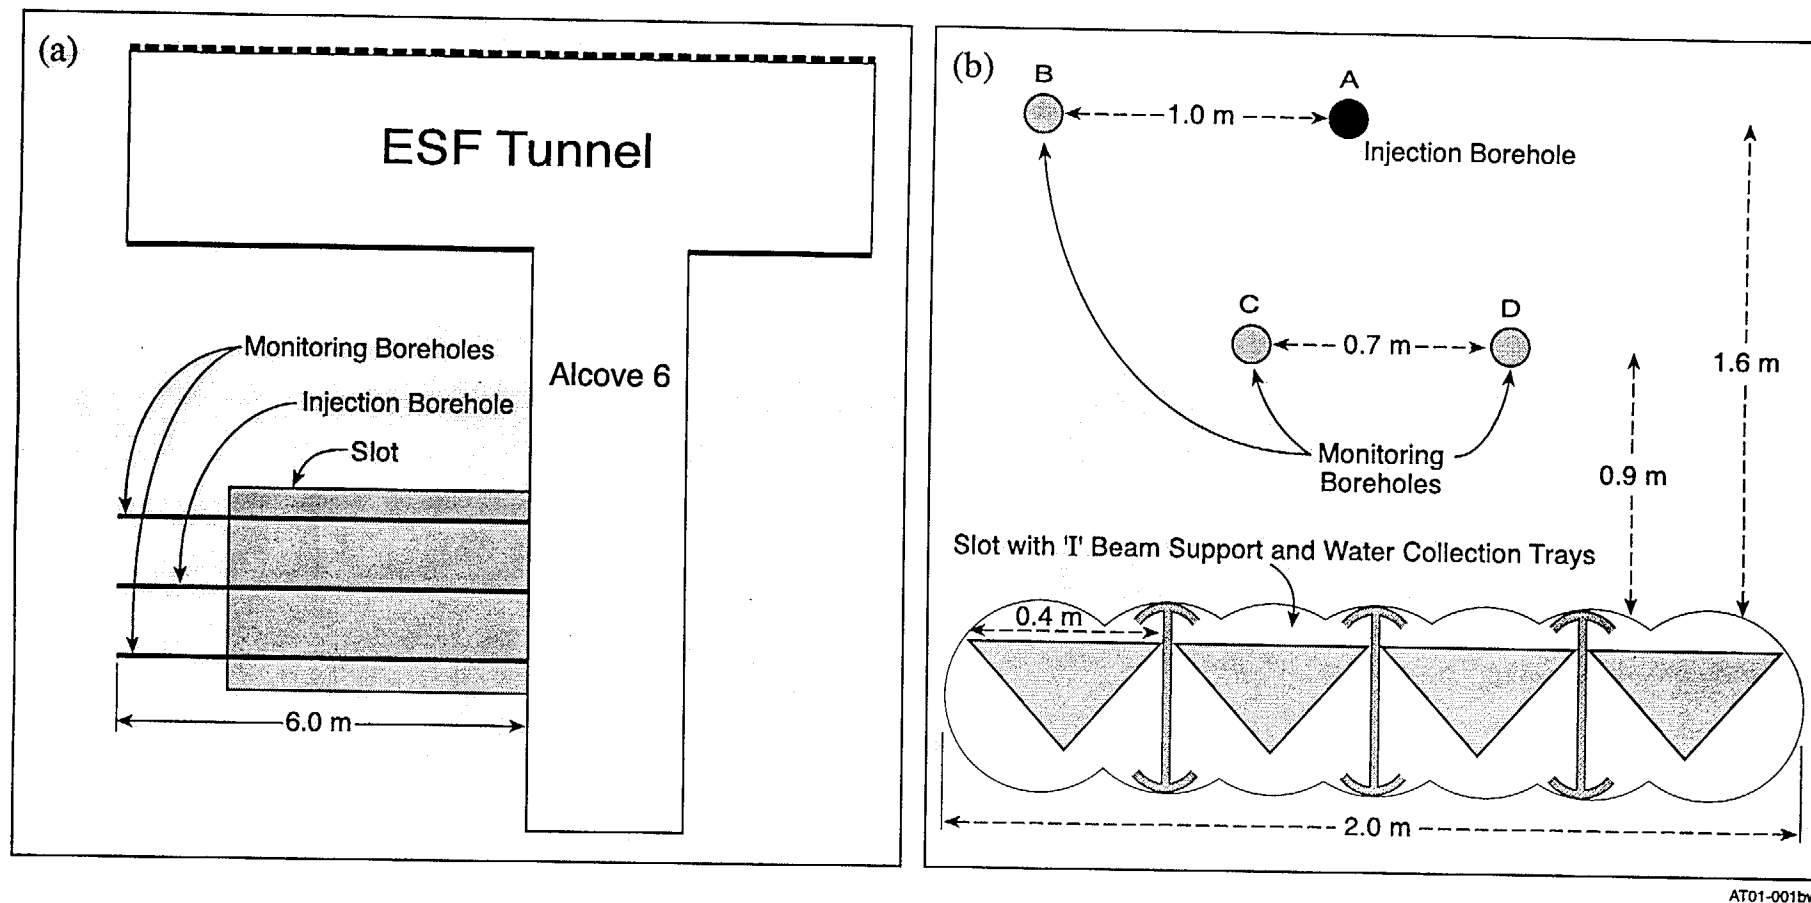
Plan view of location (a) and vertical view of layout (b) of test bed within the ESF at Yucca Mountain. Figures not drawn to scale.
